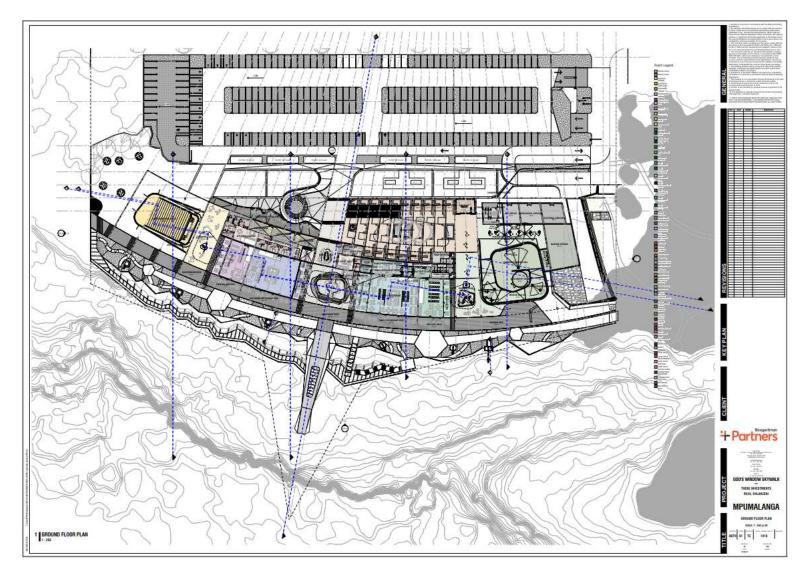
Floor plan for the initial development layout showing the development up to the cliff edge
